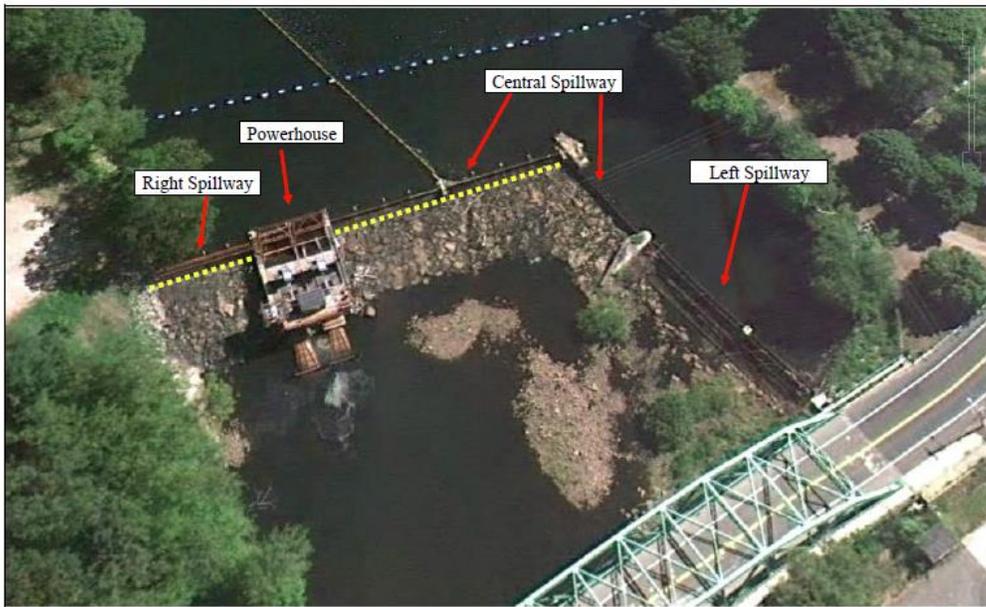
Project layout. (Source: 2014 FERC inspection report)
